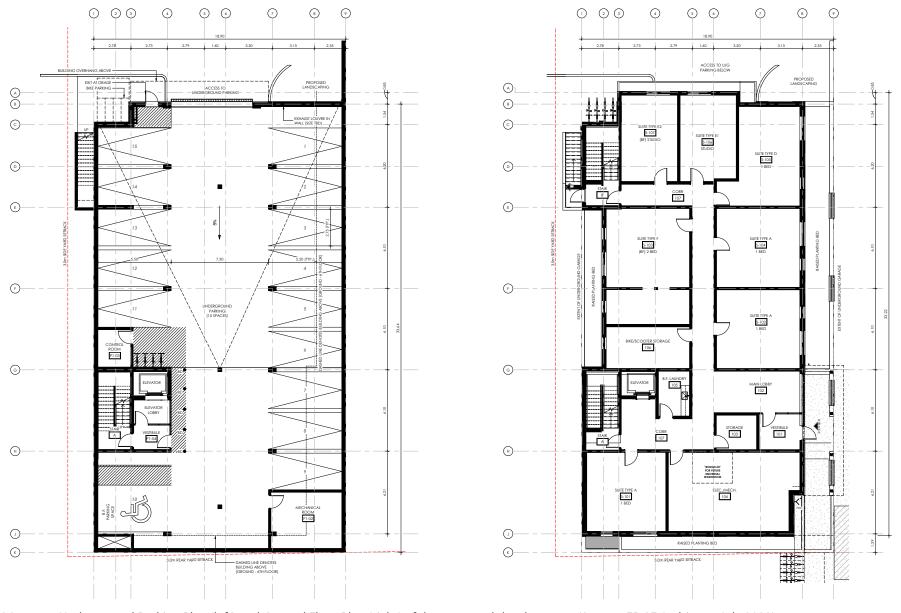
Underground Parking Plan (left) and Ground Floor Plan (right) of the proposed development. (Source: EDGE Architects, July 2023)
